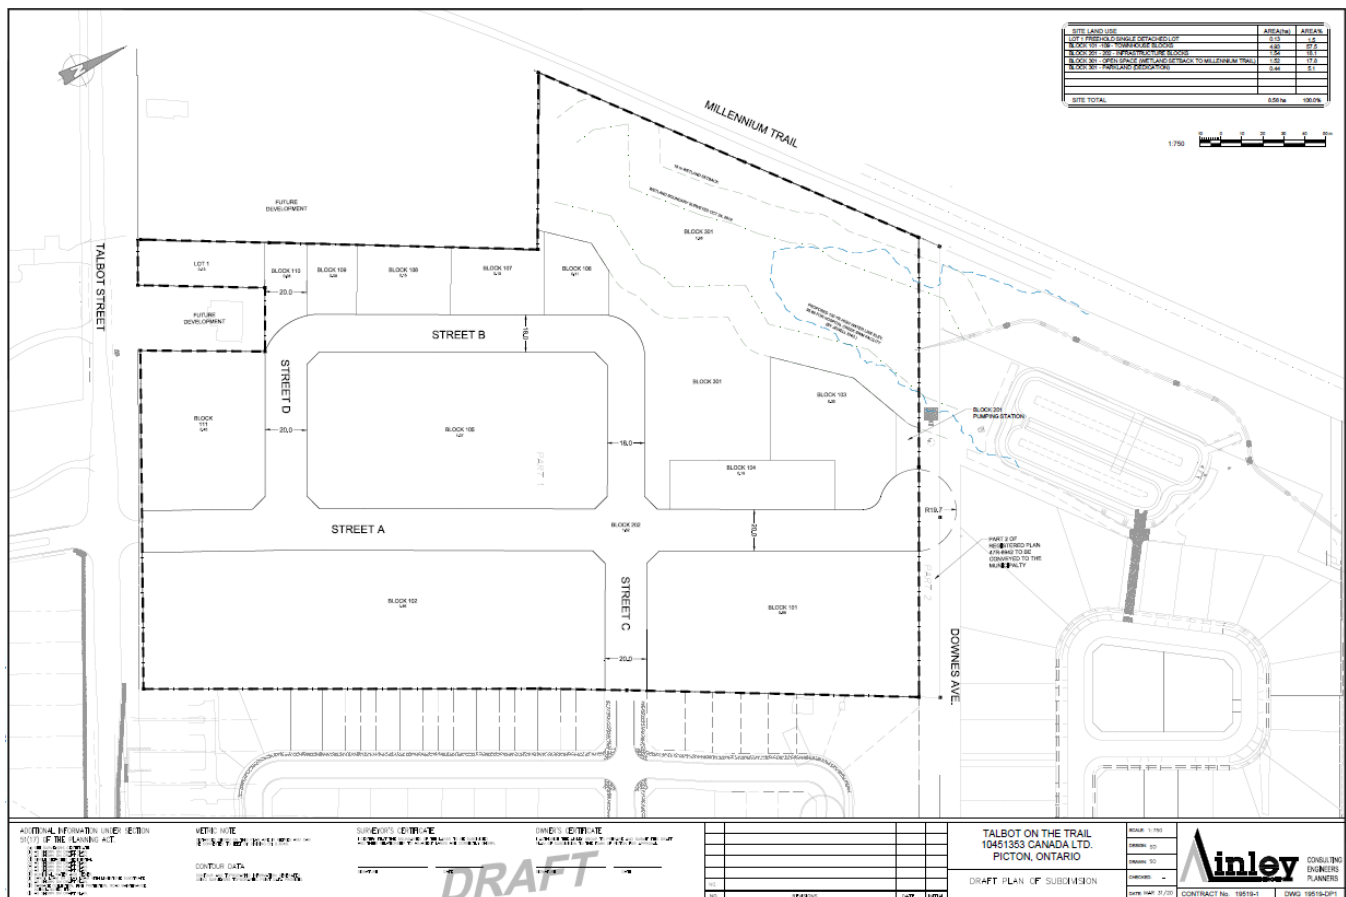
Draft Plan of Subdivision (Source: Ainley Group)
